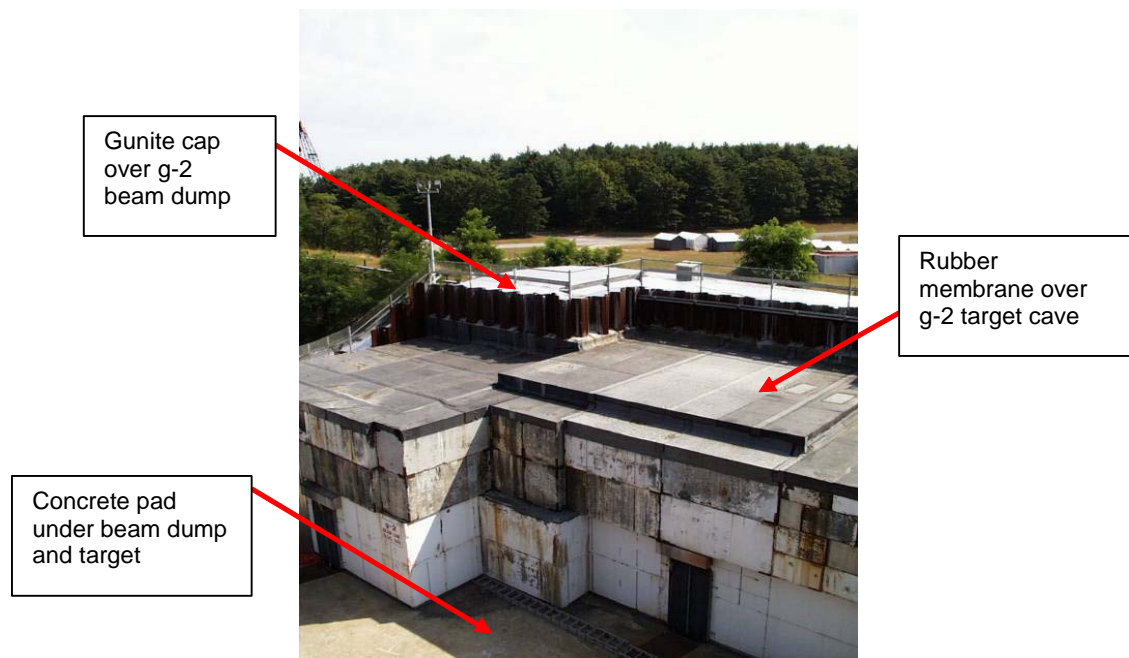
a Roof and Concrete Floor over Activated Soil Areas at Building 912
